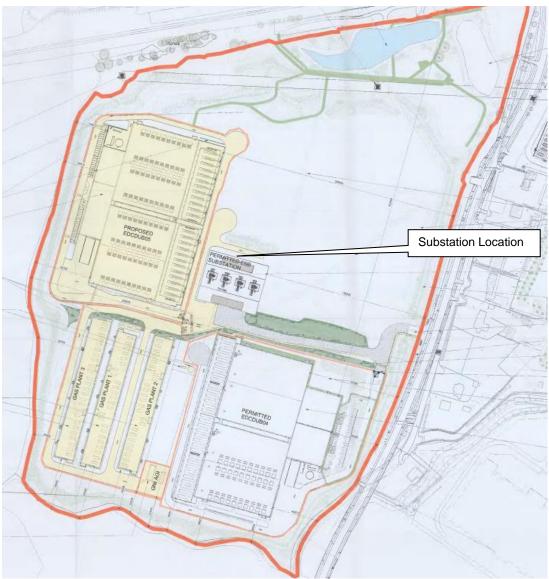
Extract from the Further Information stage site layout plan of Reg. Ref.: SD21A/0042, labelled to indicate the location the permitted substation
